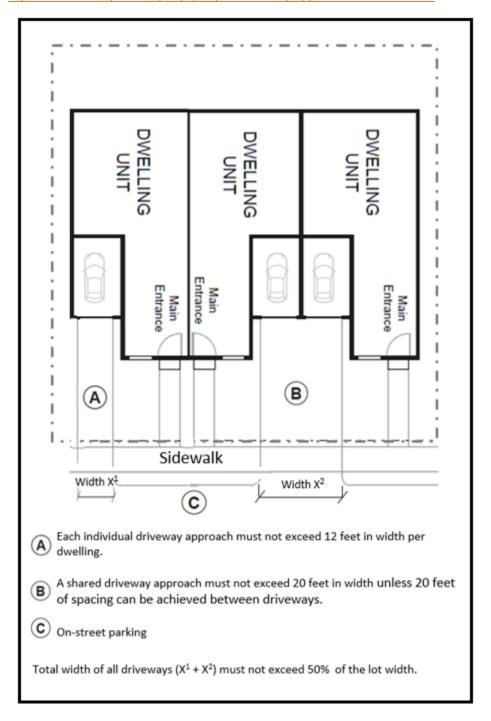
B. Side-by-Side Triplex/Quadplex Driveway Approaches – Local Street
